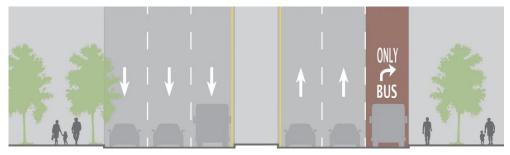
| Alternative 4 cross-section of Chain Bridge Road from International Drive to Tysons One Place
